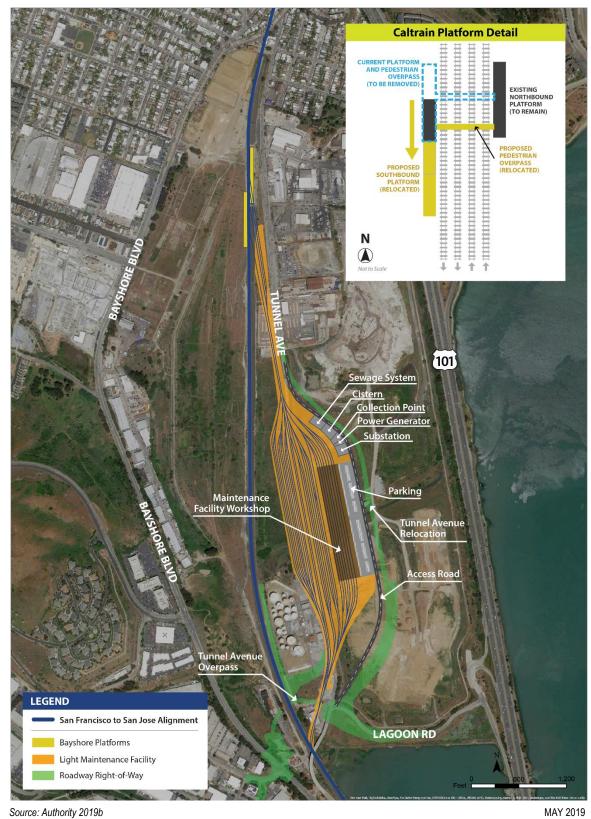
East Brisbane Light Maintenance Facility Layout—Alternative A
